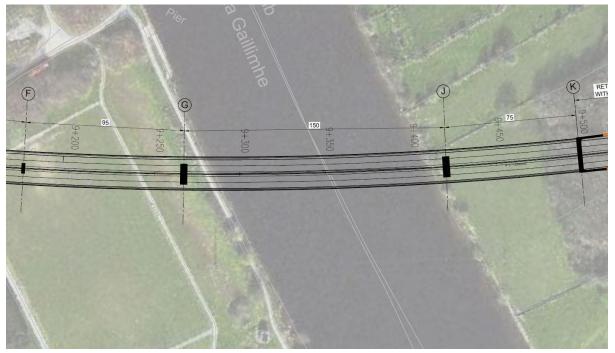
Plan view of proposed pier locations at River Corrib channel crossing
